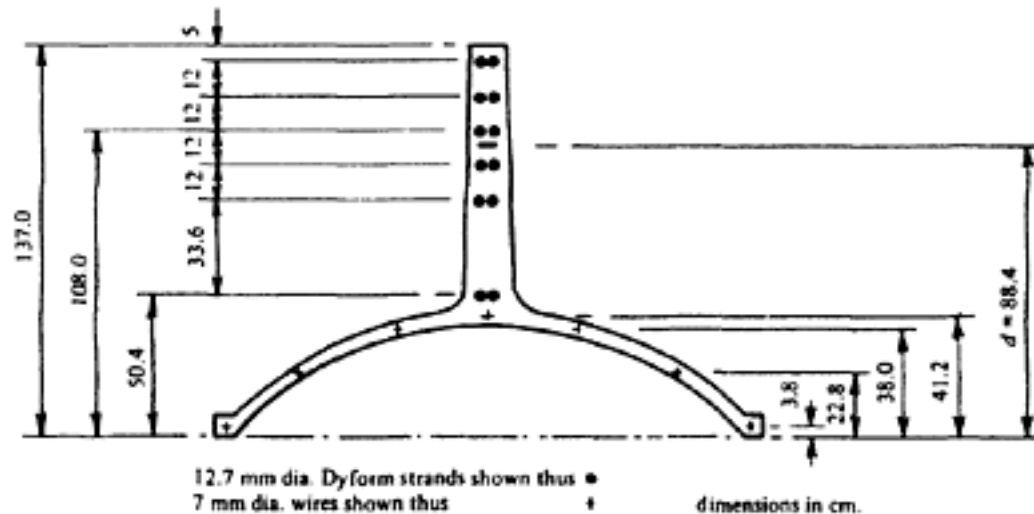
Cross-section of roof unit at support B (example 9.2.8)
